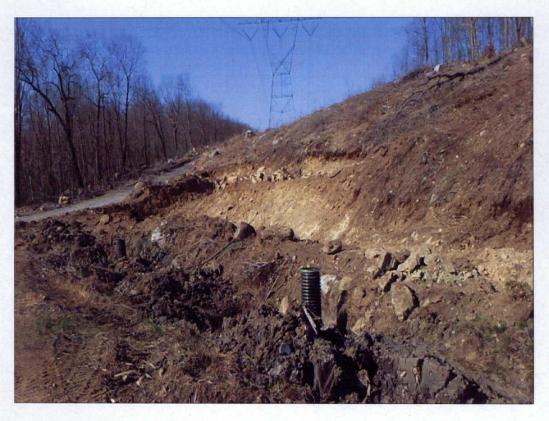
An overview of Dump Area D facing Northwest prior to excavation activities, taken on 2/28/2012 at 1419 hrs.
